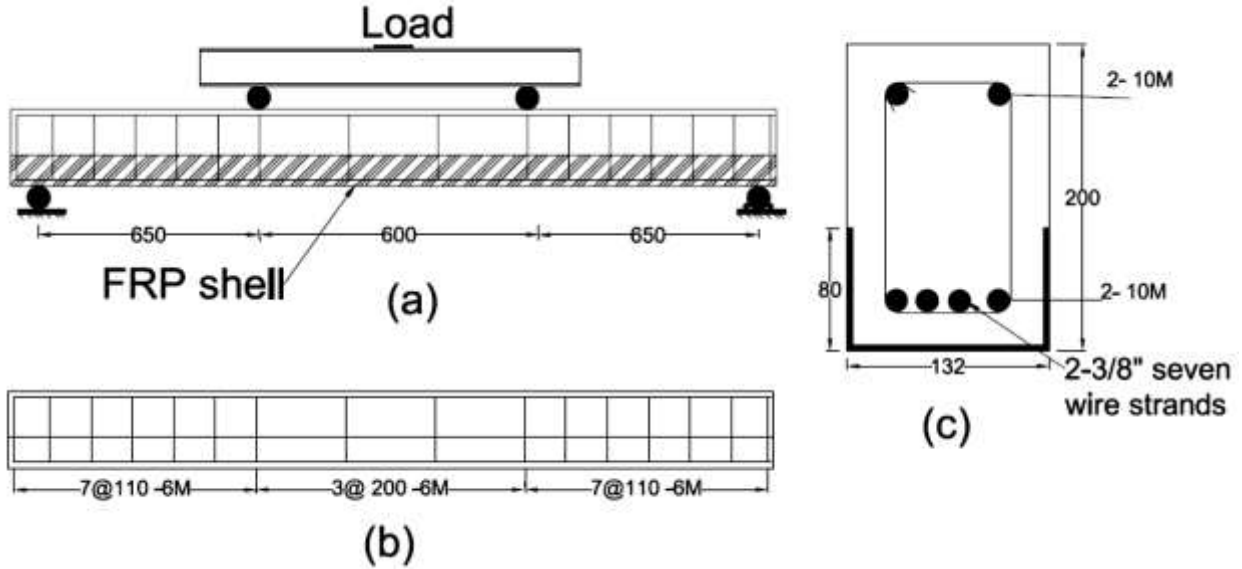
Specimen geometry and reinforcement details of simple reinforced beam with FRP shell (a) elevation (b) shear reinforcement detail (c) cross-section
